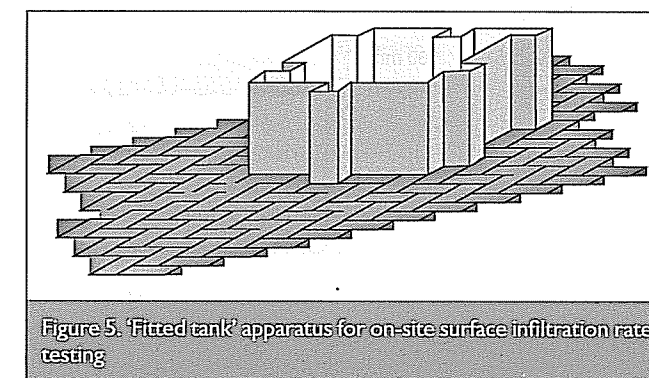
'Fitted tank' apparatus for on-site surface infiltration rate testing
